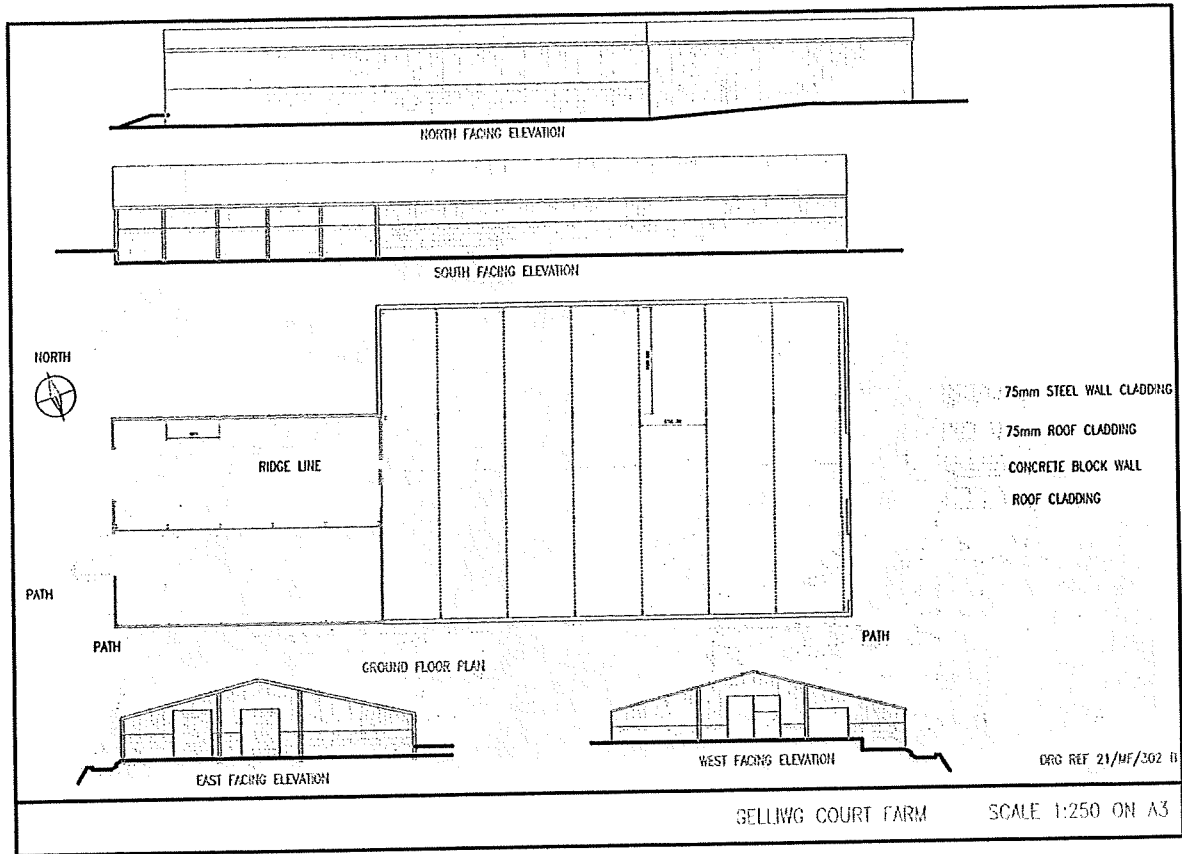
Applicant's existing elevations and floorplan, showing the buildings as they would be following implementation of agricultural prior approval decision issued in 2021
